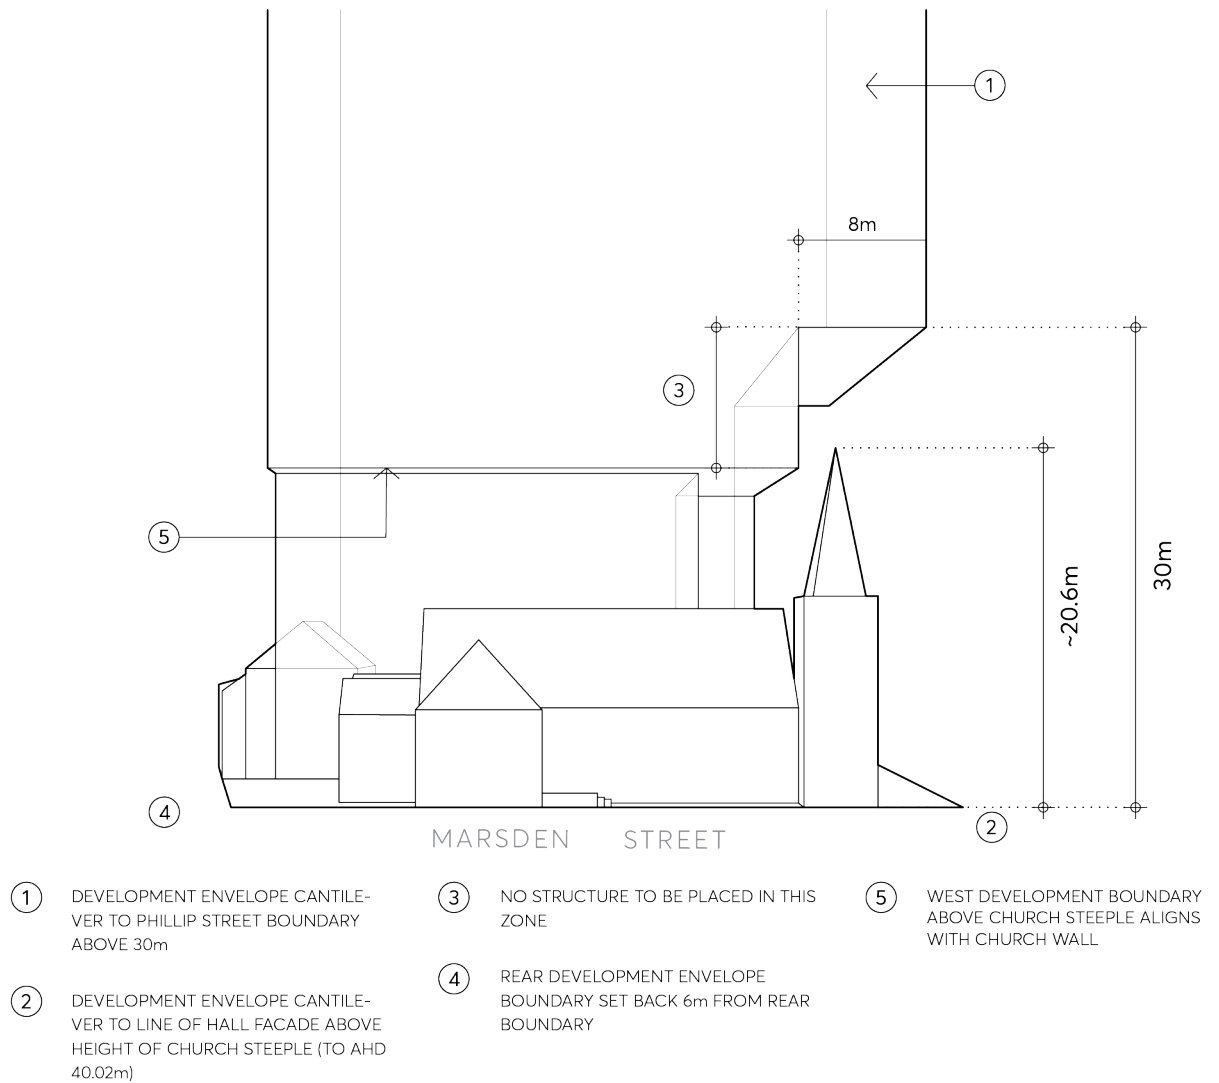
Maximum building envelope – Ground plane from Marsden Street NTS (Source: TKD Architects)
